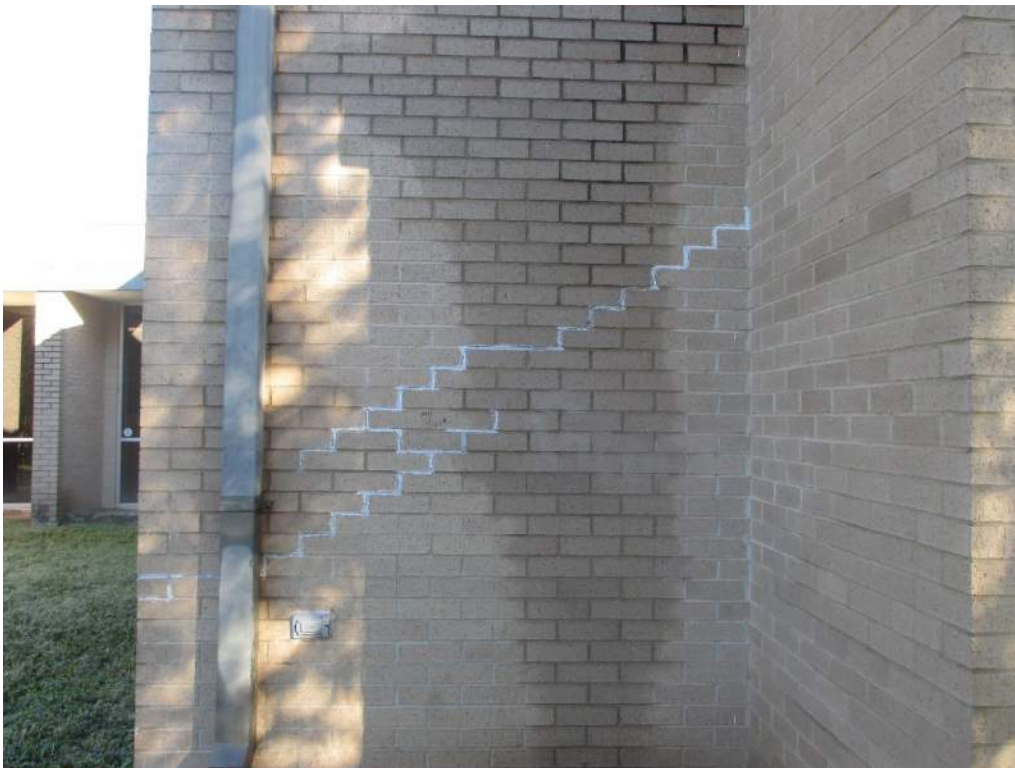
Crack in brick veneer at the south side of the 1985 addition filled with a cracked, non-matching sealant. The many reentrant corners in the Addition create stress risers in the brittle masonry veneer.
